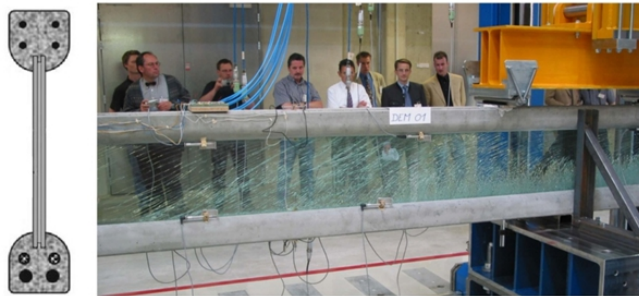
The cross-section of the glass-concrete beam (left) and the specimen during test (right) [27].
